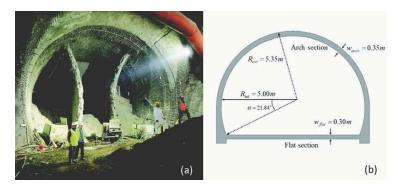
Sprayed concrete tunnel beneath Santiago, Chile: (a) image taken during construction; (b) geometry used in FE modelling.
